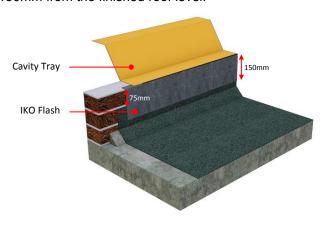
Typical interface with cavity tray on a flat roof abutment
